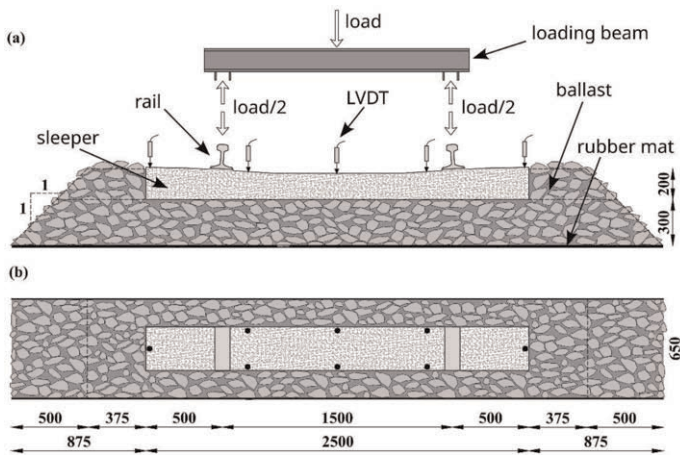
Schematic of test set-up with dimensions in mm; (a) cross-sectional view; (b) plan view.
